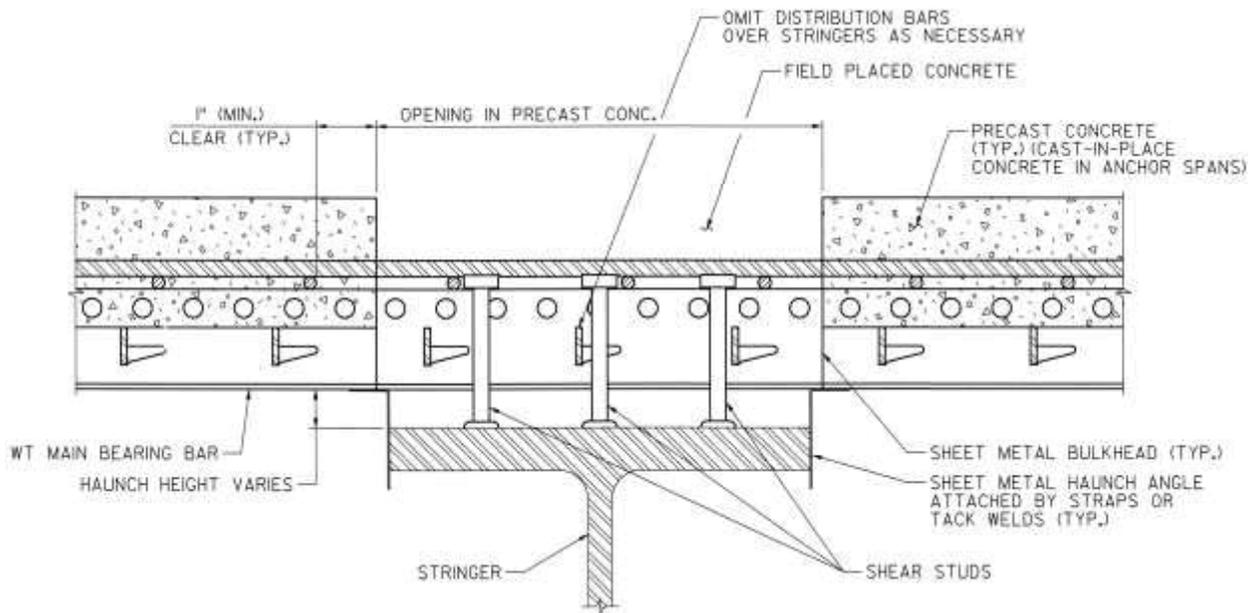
Longitudinal precast Exodermic deck section including shear studs for composite action
